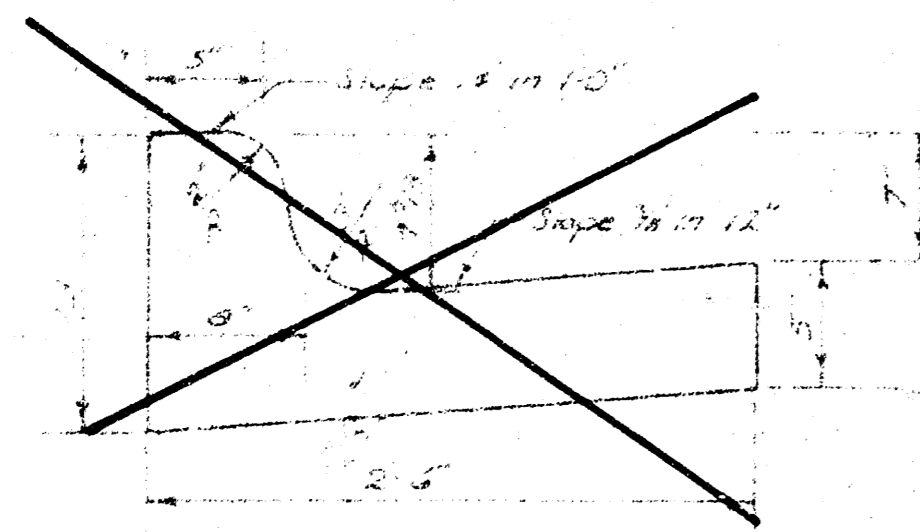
DETAIL OF TRANSVERSE CONSTRUCTION JOINTS
